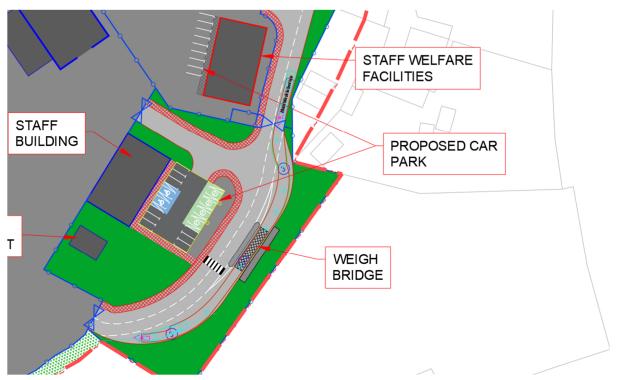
Proposed Vehicle Tracking access to weighbridge
